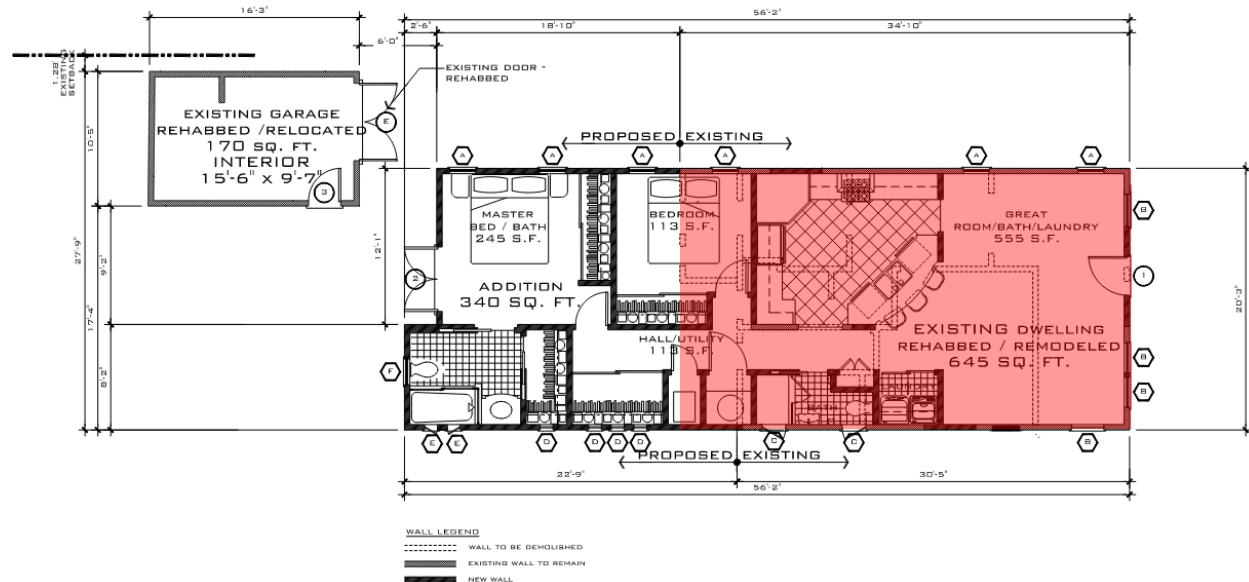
Proposed site plan. The footprint of the existing residence is shaded red. Source: Architectural Design Solutions, "Regalado Remodel," Sheet A-5 (November 19, 2024). Edited by Page & Turnbull.
